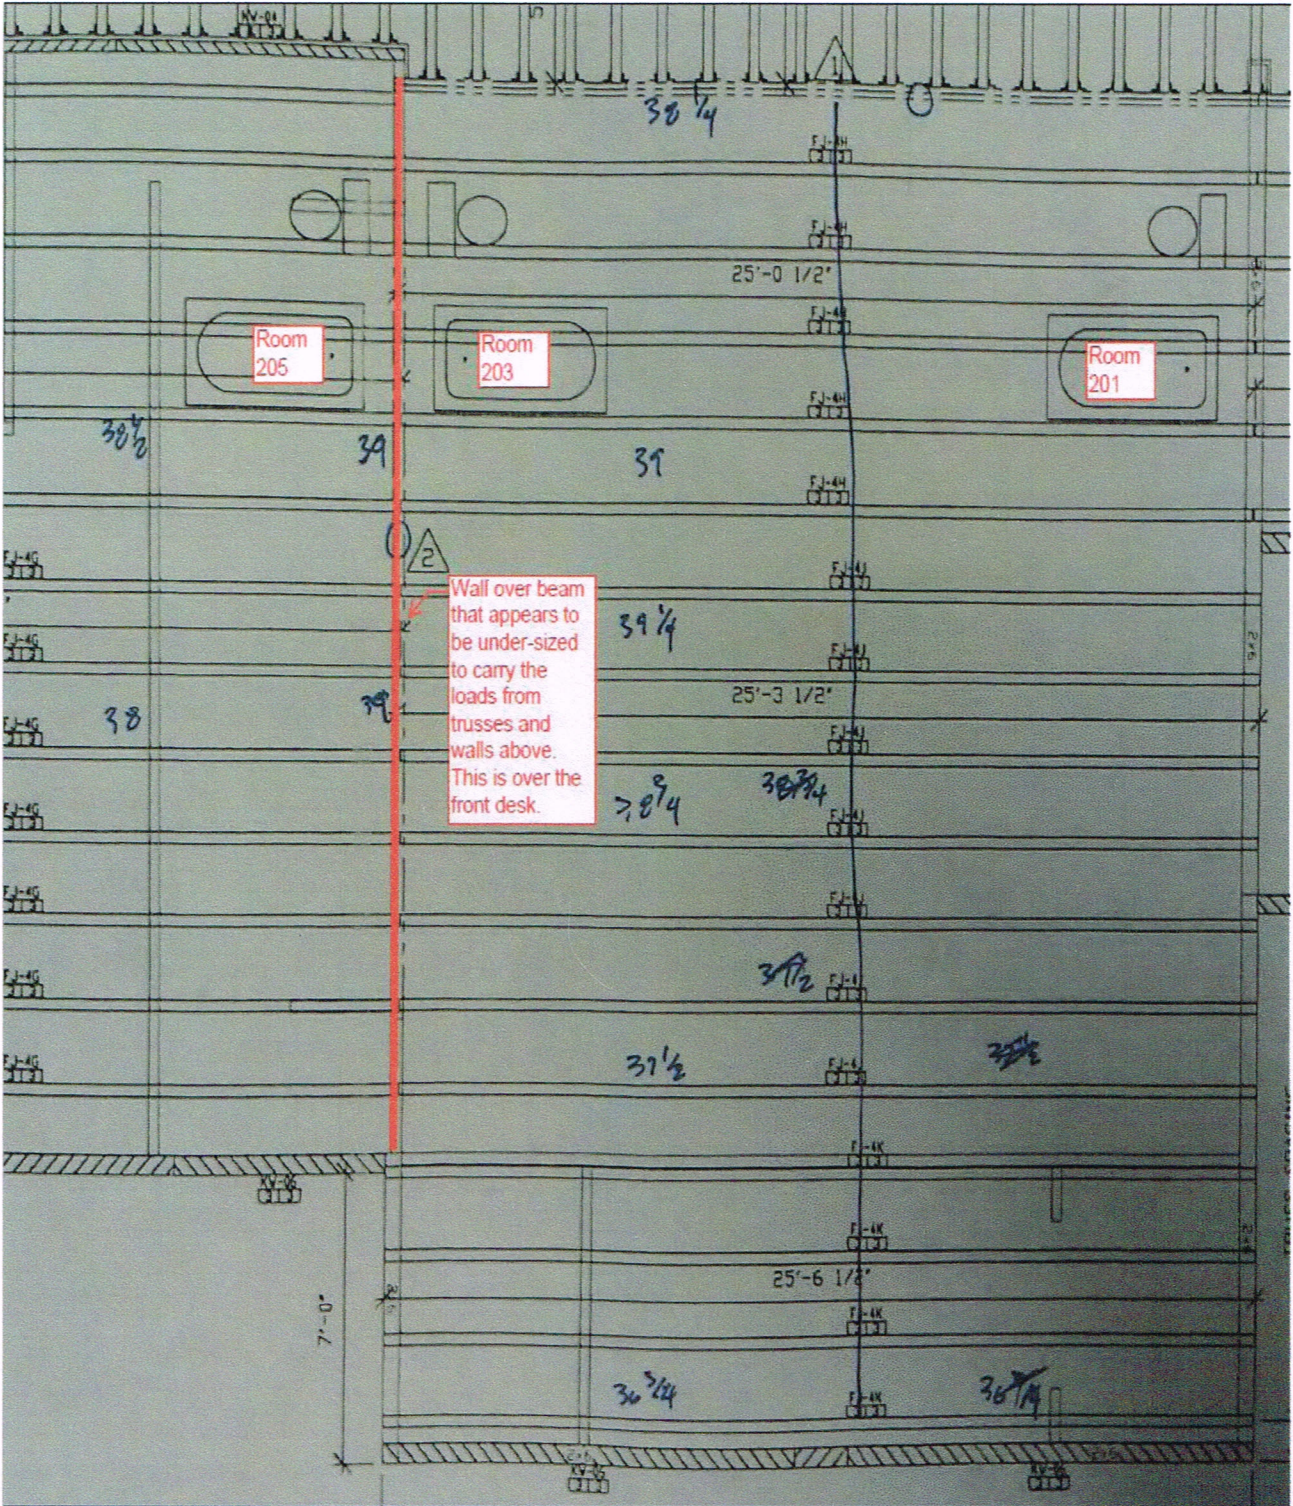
Location of the beam below the wall separating rooms 203 and 205.
